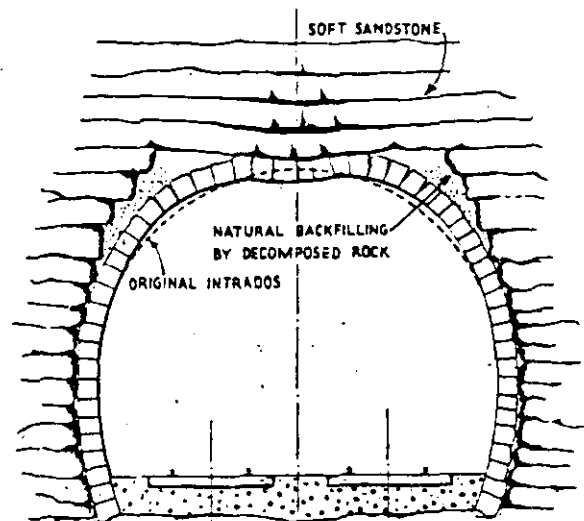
Deformation of a malconstructed tunnel arch by loosening pressure
